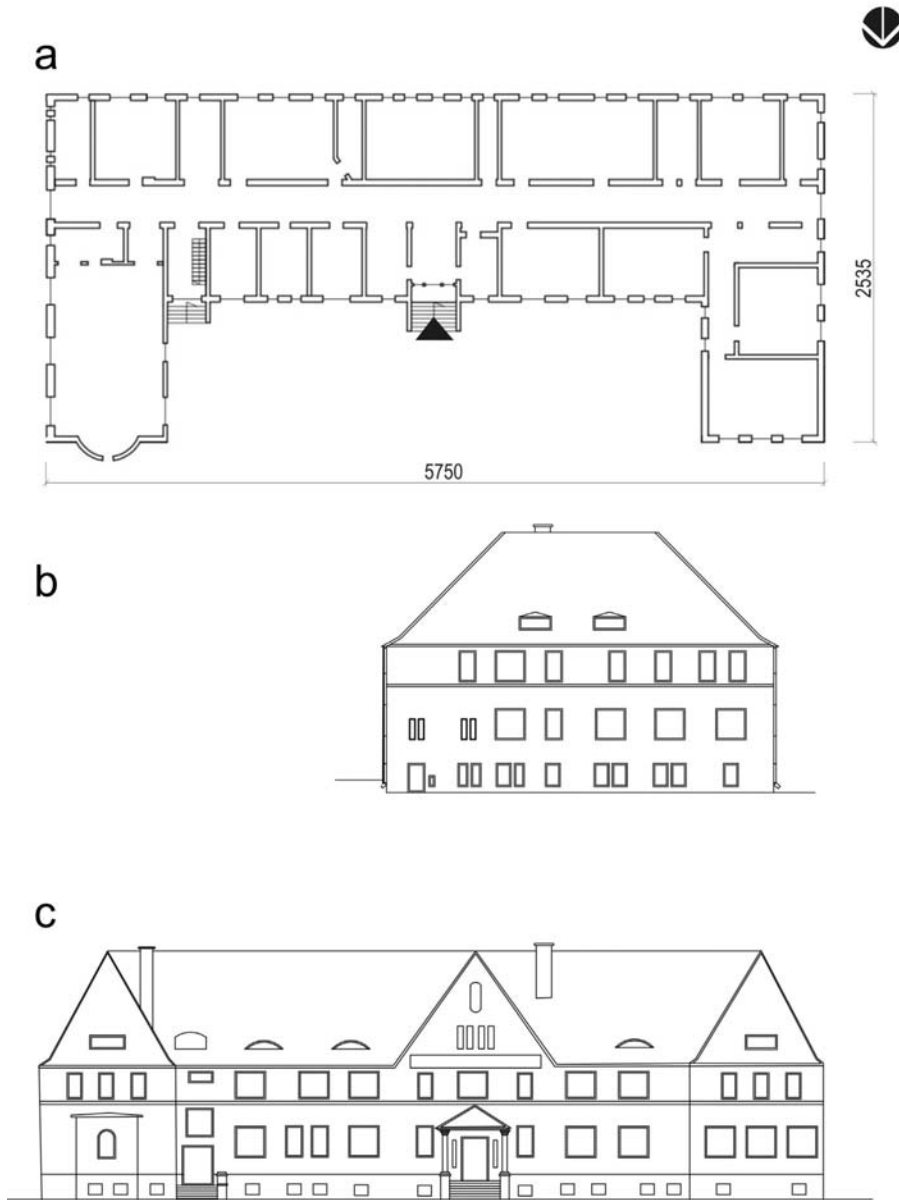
The house of Caritas Centre in Małkowice village: a – plan of the ground floor, b – section a – a, c – front elevation (draw by K. Adamczyk)
